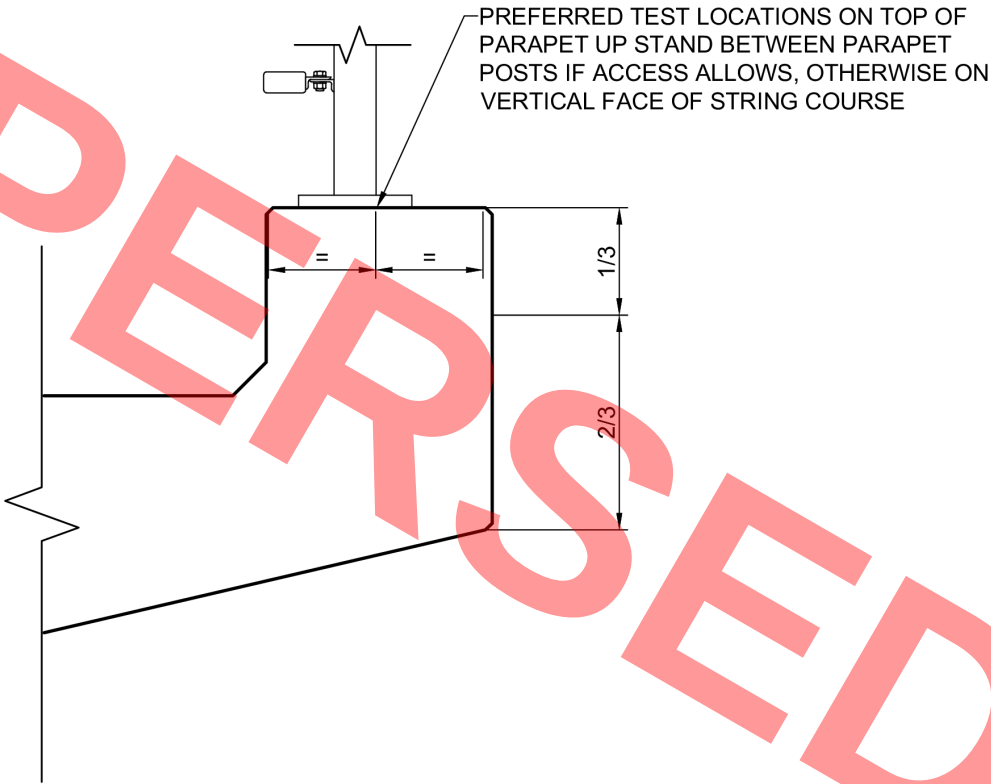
Location of test areas to parapet stringcourse beams subject to traffic spray
